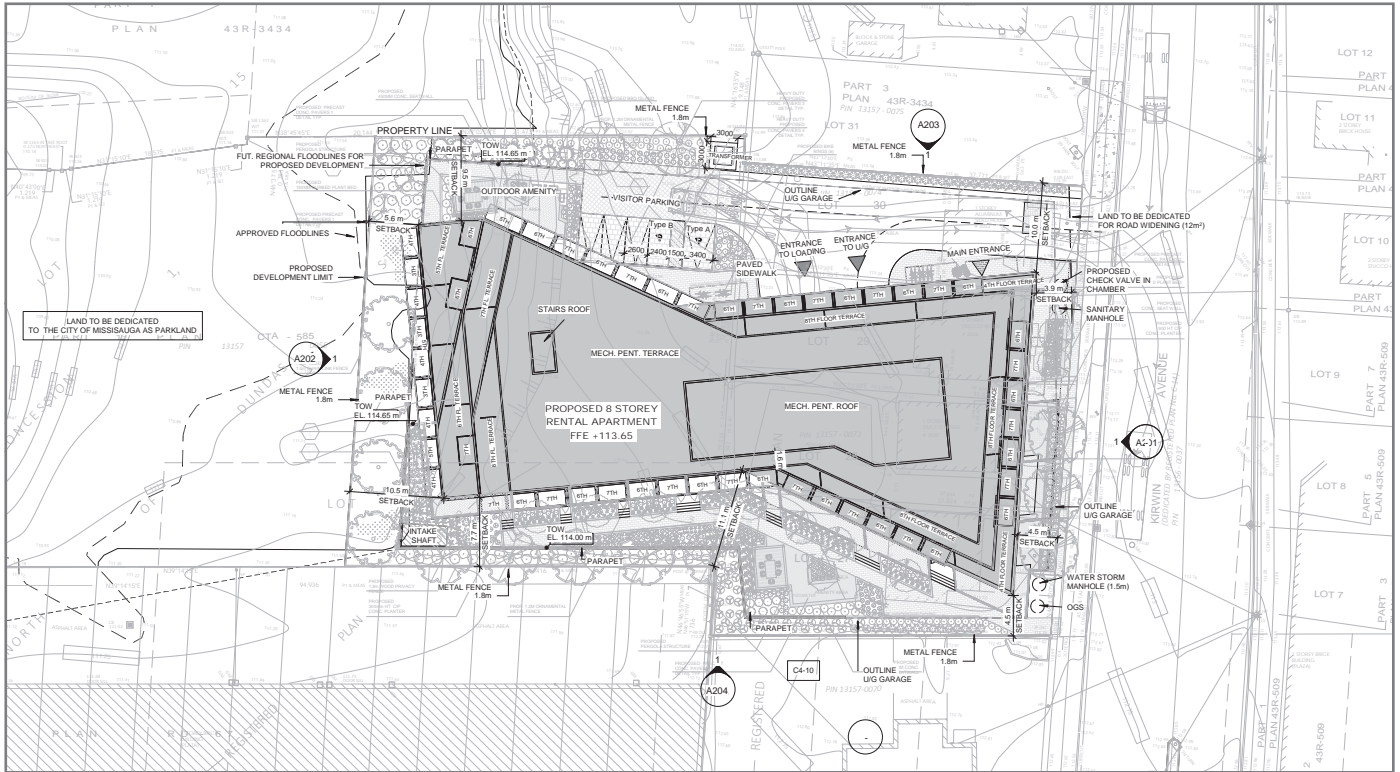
Proposed Site Plan Prepared by KFA architects + planners inc.
